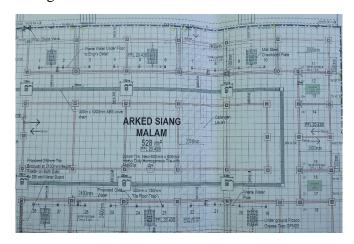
(Drawing shown the 8 area needed for grease trap)
